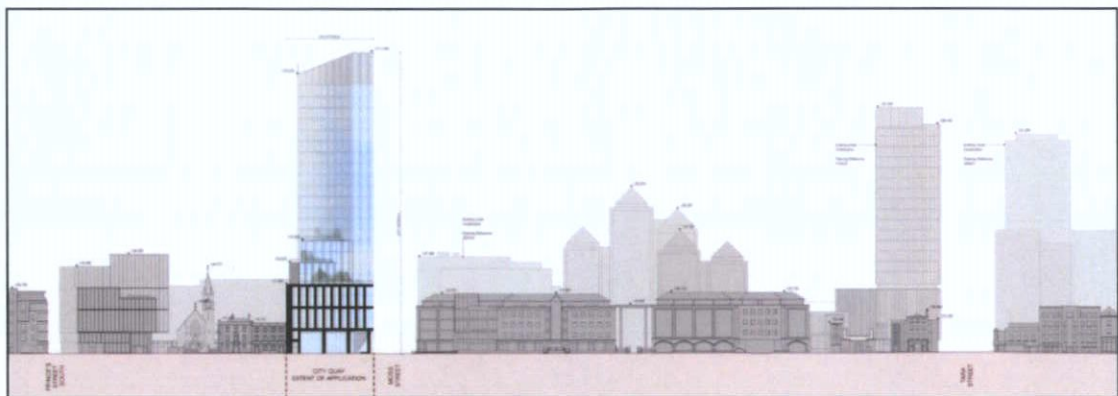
East Elevation (Mahoney Architecture 2022)
